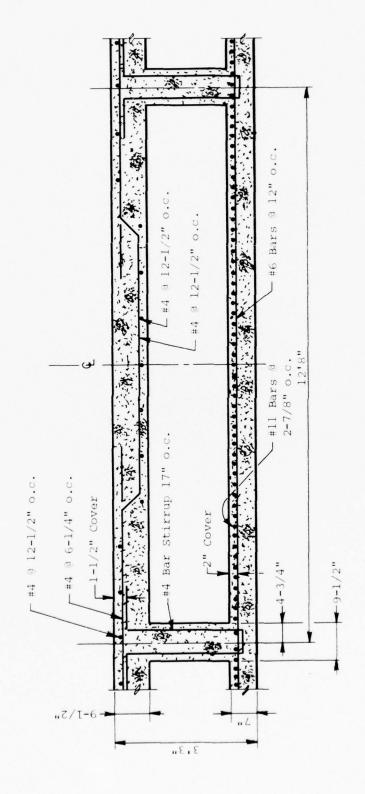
Box Girder for 100-Foot Span 500 psf Surcharge
